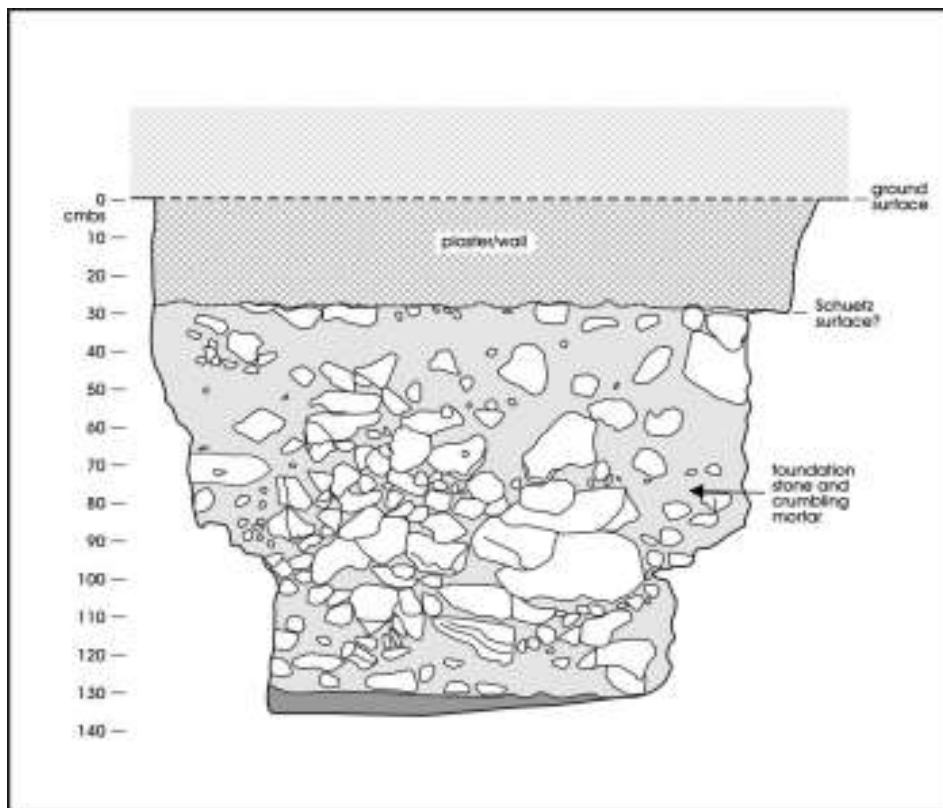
Profile of the foundation exposed in the west wall of Trench 2.
